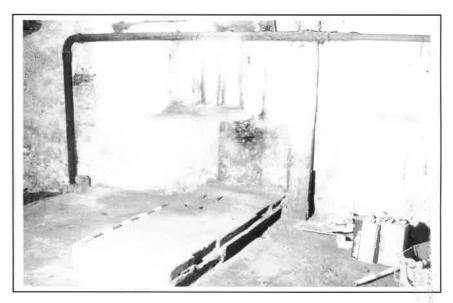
Engine mounting block towards north end of 'Brewhouse' against west wall
